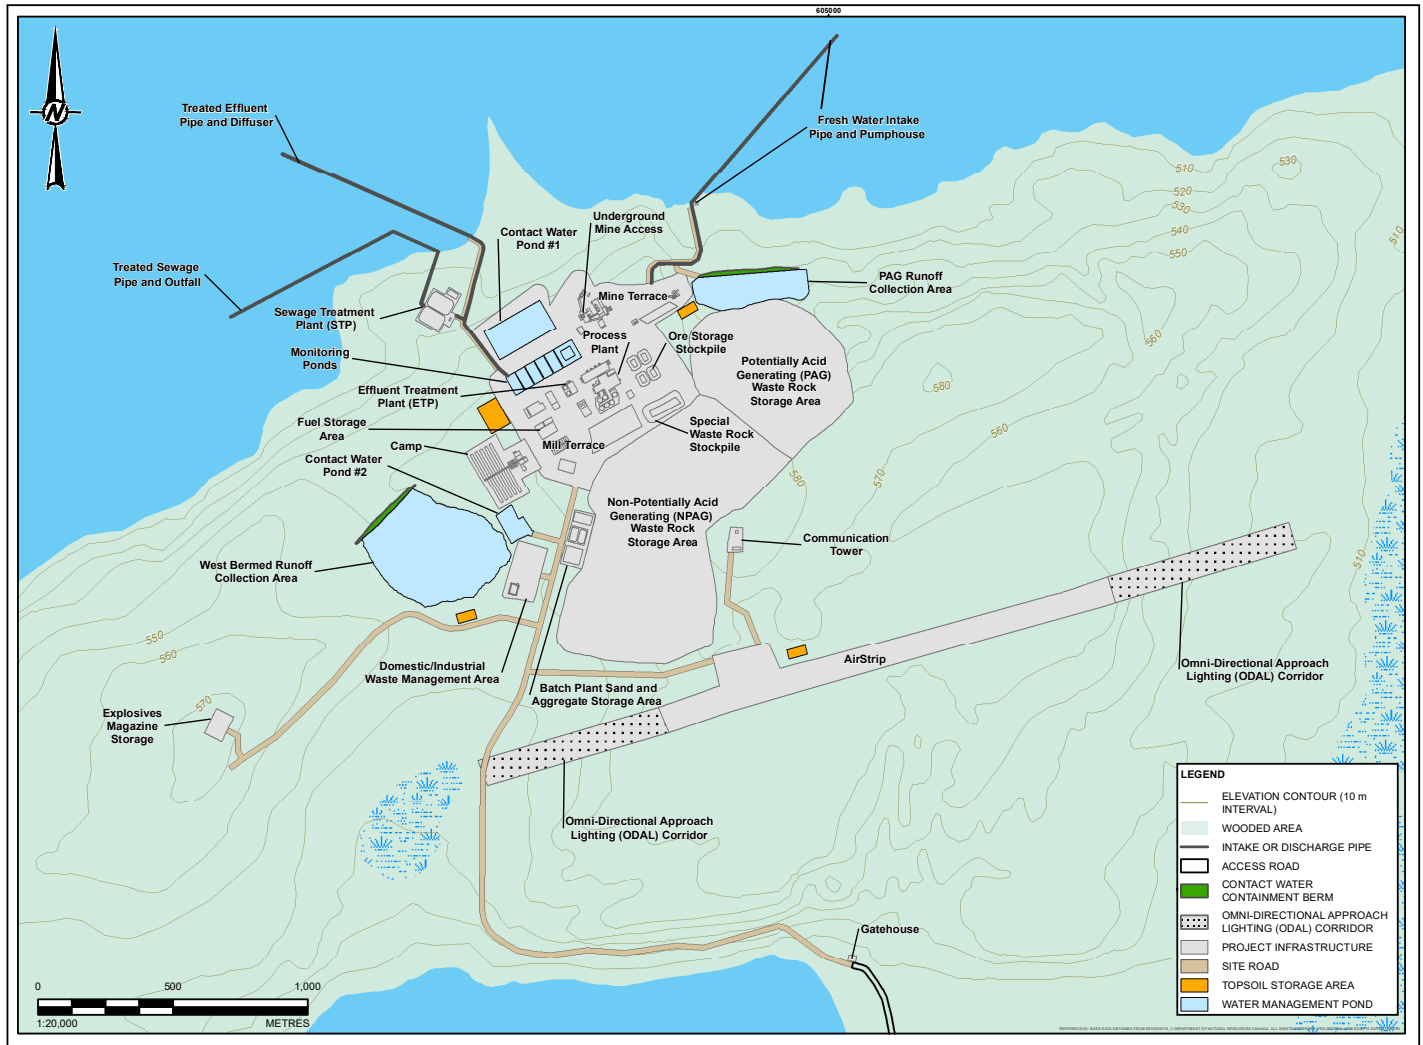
Layout of Infrastructure and Facilities for the Rook I Project
